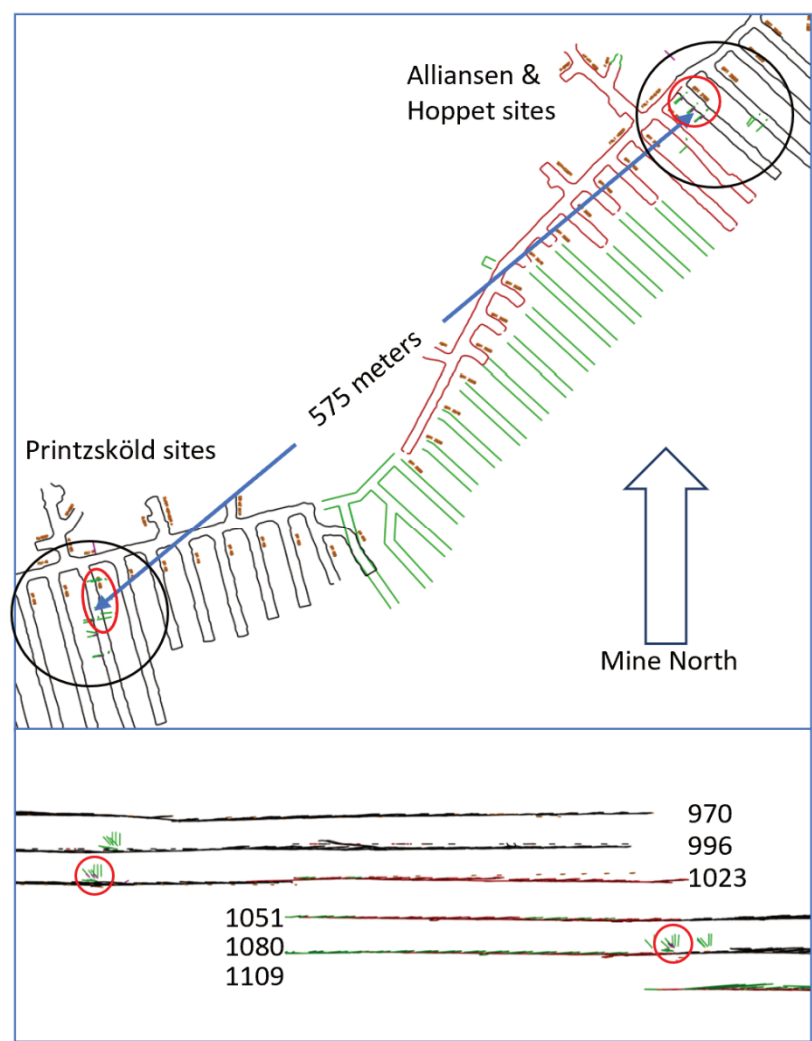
Mine layout and instrumentation sites viewed from above (top) and from the side (bottom)
